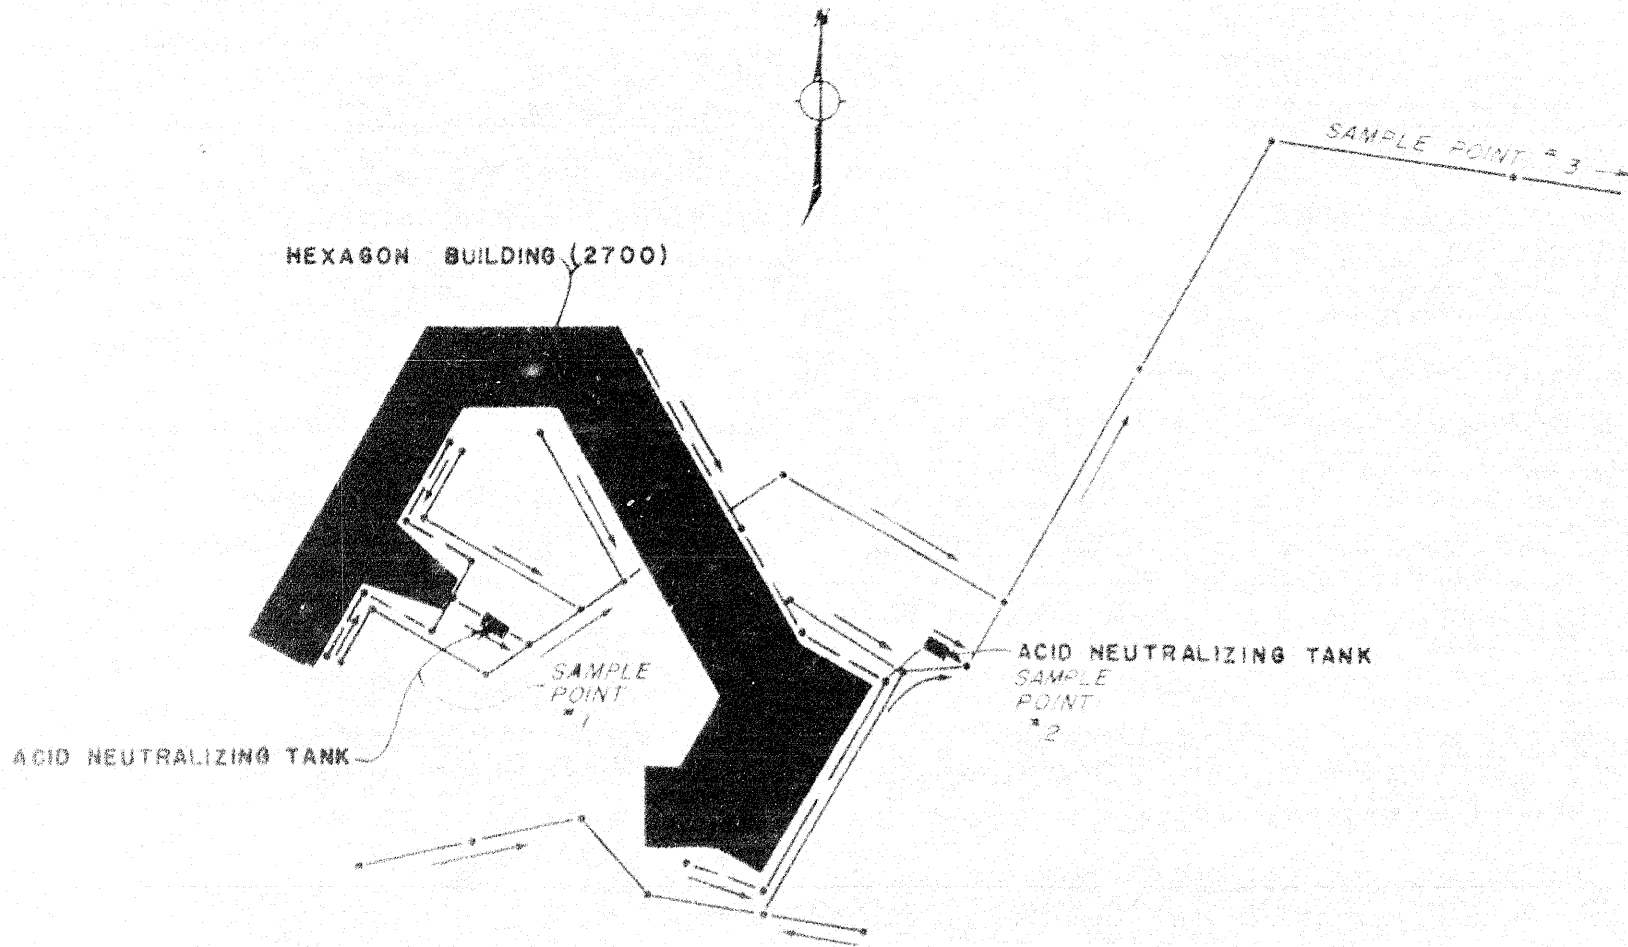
HEXAGON BUILDING-SEWER DETAIL.
